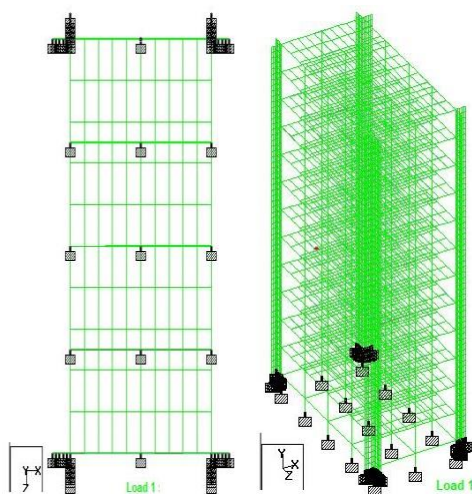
Typical Plan and 3D view of External Shear Wall at Corners (ESXZ2C)
